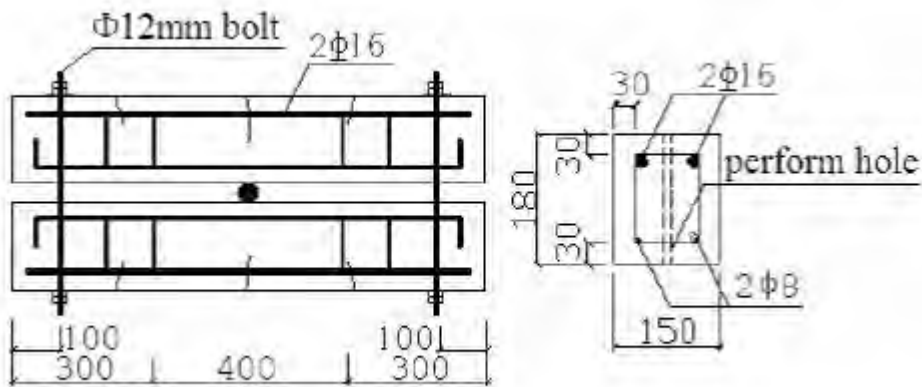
Layout of reinforcement in beams (Zhang *et al.*, 2011)
